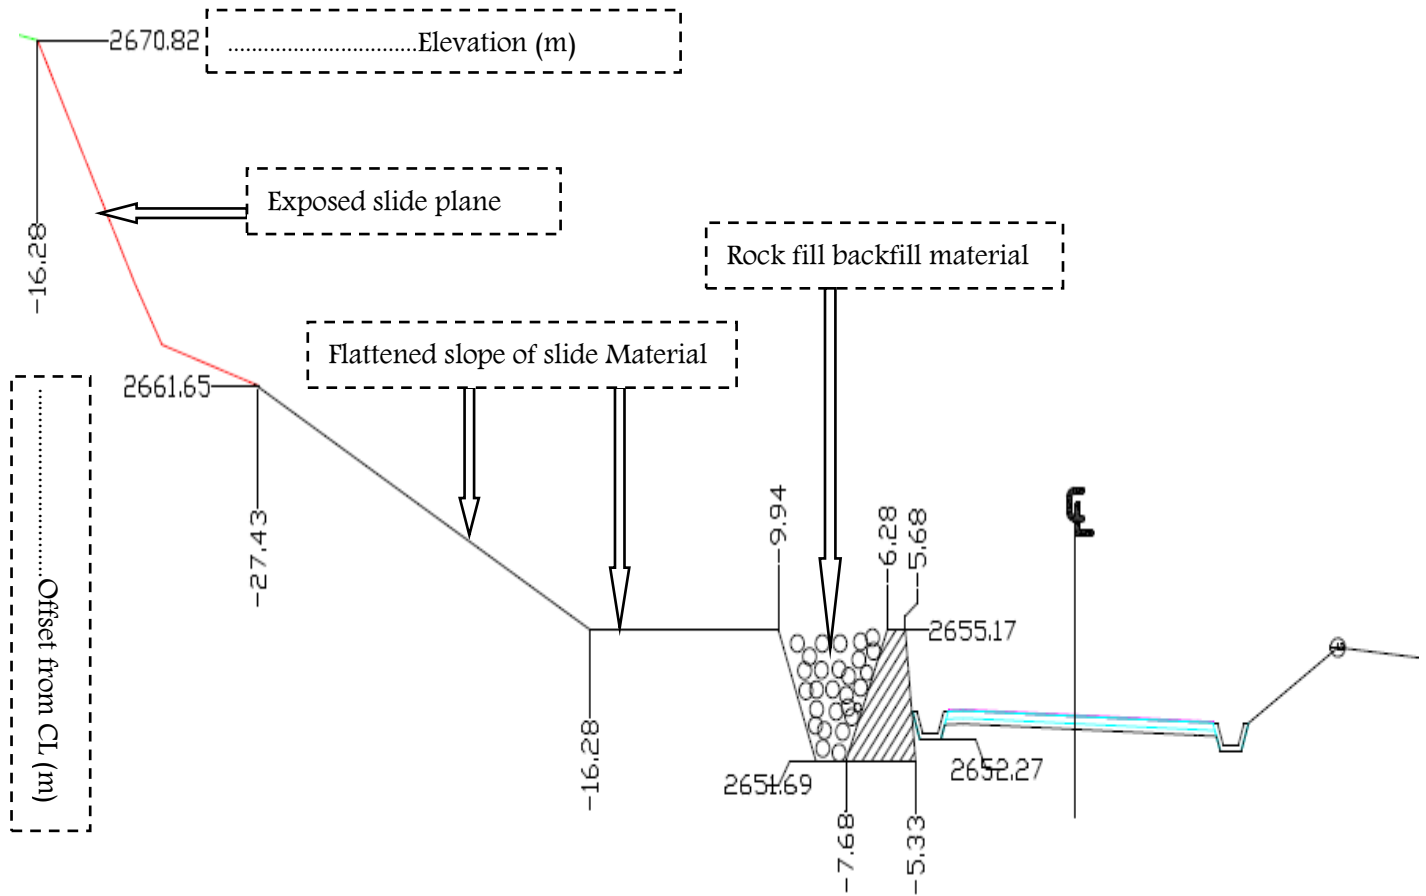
Provision of retaining wall Sta.72+760LHS
